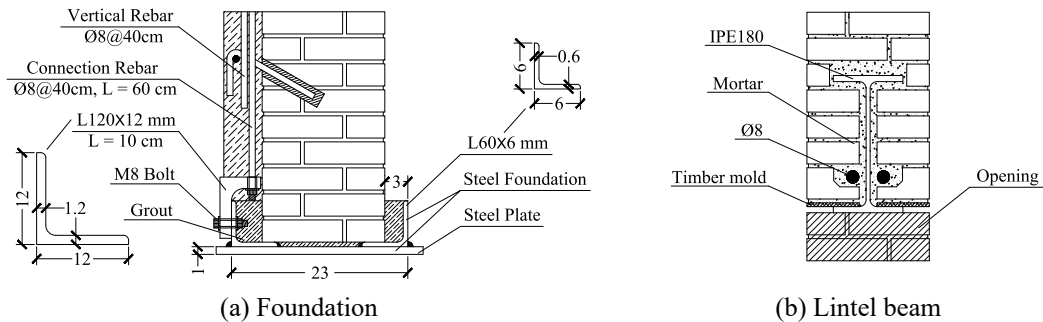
Steel foundation and lintel beam details (dimensions are in cm)
